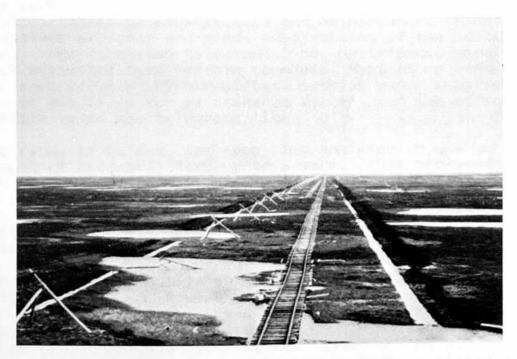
Skeleton track was laid into Churchill, 29 March 1929; this shows it across the "Barrens" at spring break-up when train-filling and hacking was commenced to build embankment and subsequently ballast the new railway. Note telegraph line on tripods.
